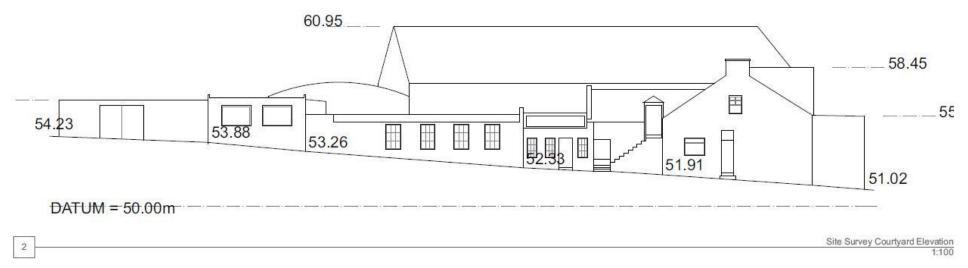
West facing external elevations of the building complex at 62-64 St John's Road. Courtesy of Pink Architects
